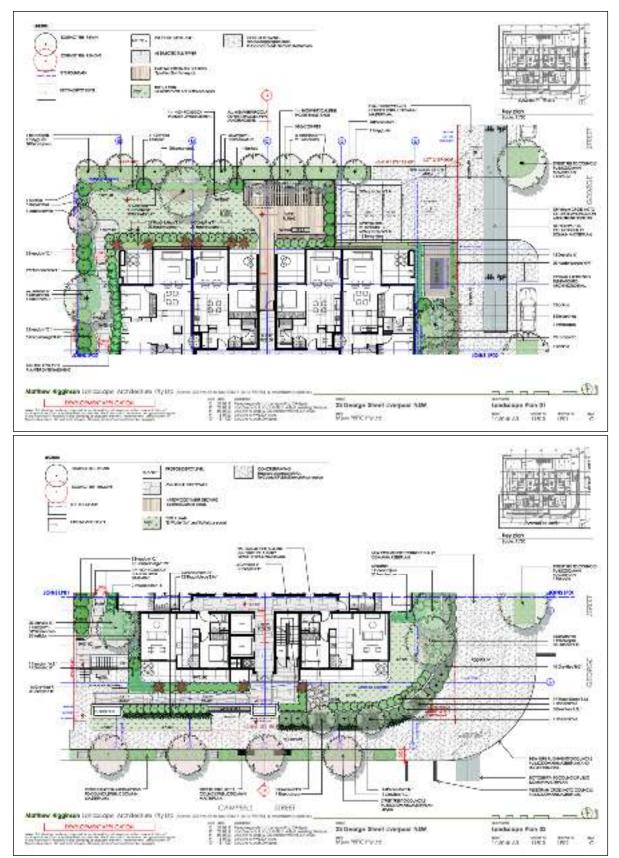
Ground Floor Landscape Plans (source: LP01 & 02-G prepared by Matthew Higgins 153
